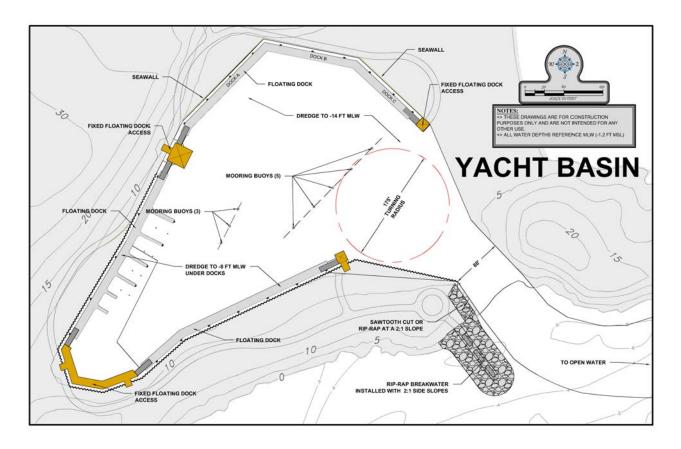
Yacht Basin Site Plan (Exhibit 1)
